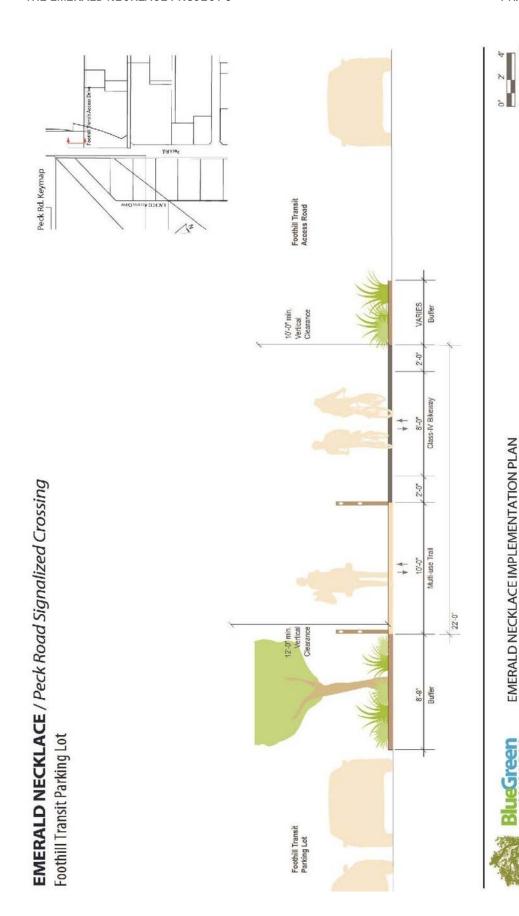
Cross section of the trails on the expanded parkway of the Transit Center parking lot.
